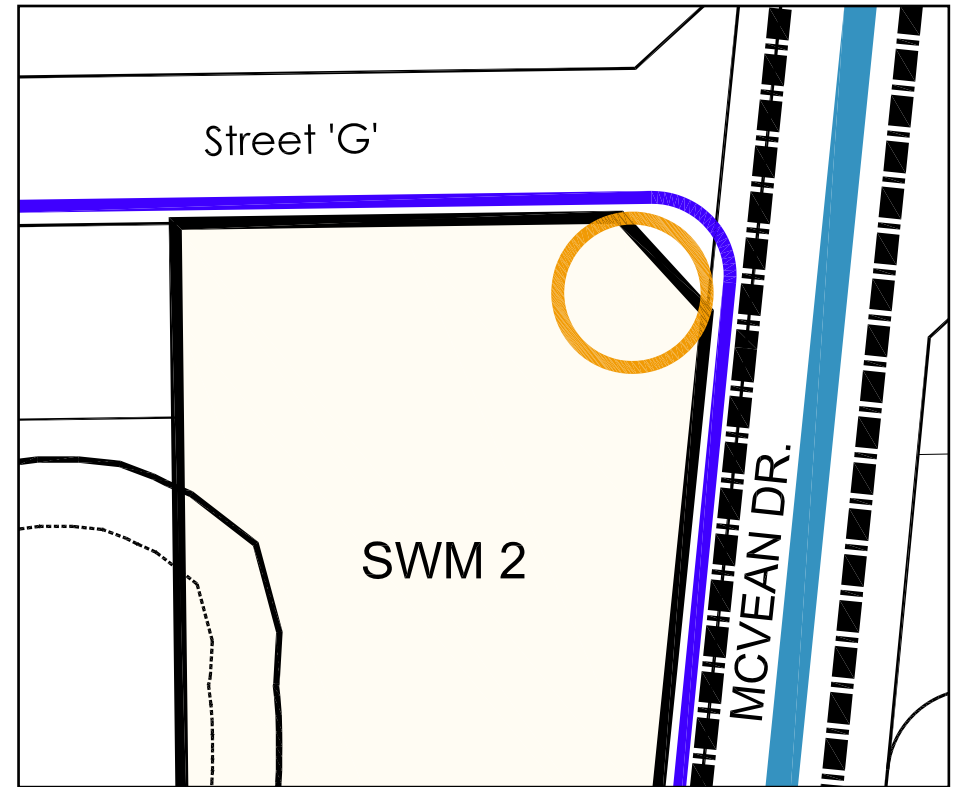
SWM Pond #2 Facility Fit Concept
